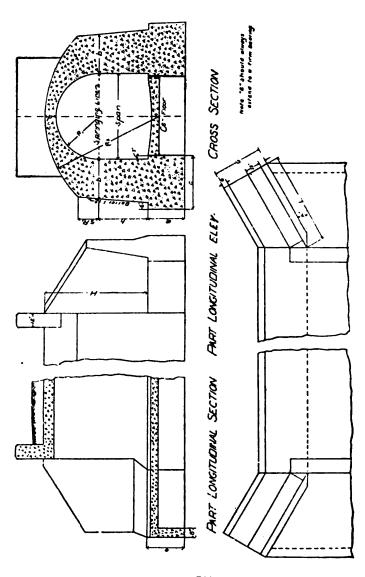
Typical Design of Plain Concrete Arch Guivert.
